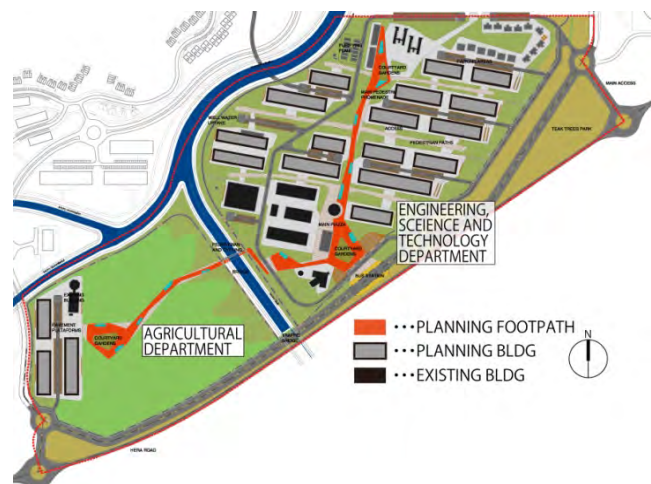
FEST and Faculty of Agriculture Campus Improvement plan
